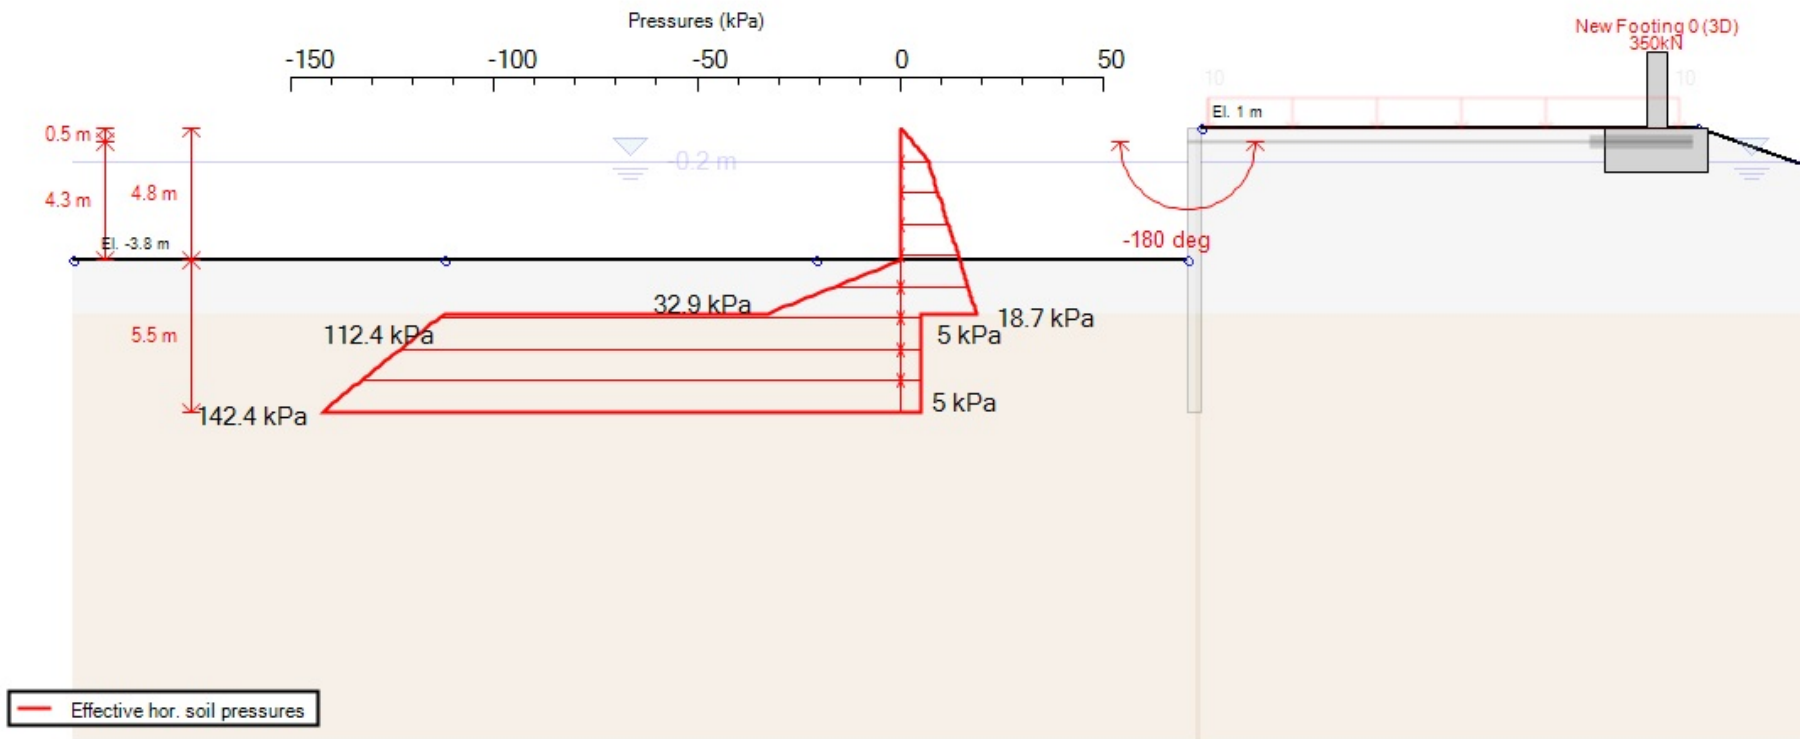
Results from Limit Equilibrium analysis for steel sheet pile wall performed in DeepXcav: Effective horizontal soil pressures
